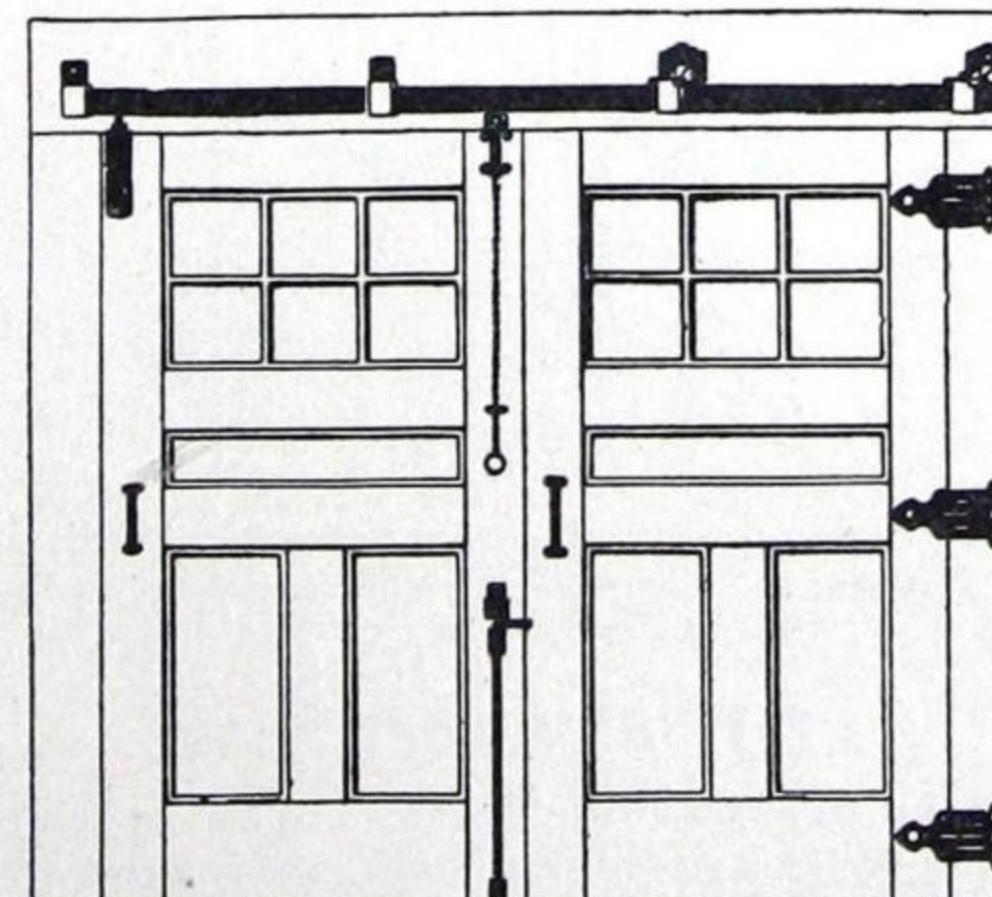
Interior elevation showing 435 Hardware, including No. 514 Spring Top Bolt and No. 524-1 Cane Bottom Door Bolt.
